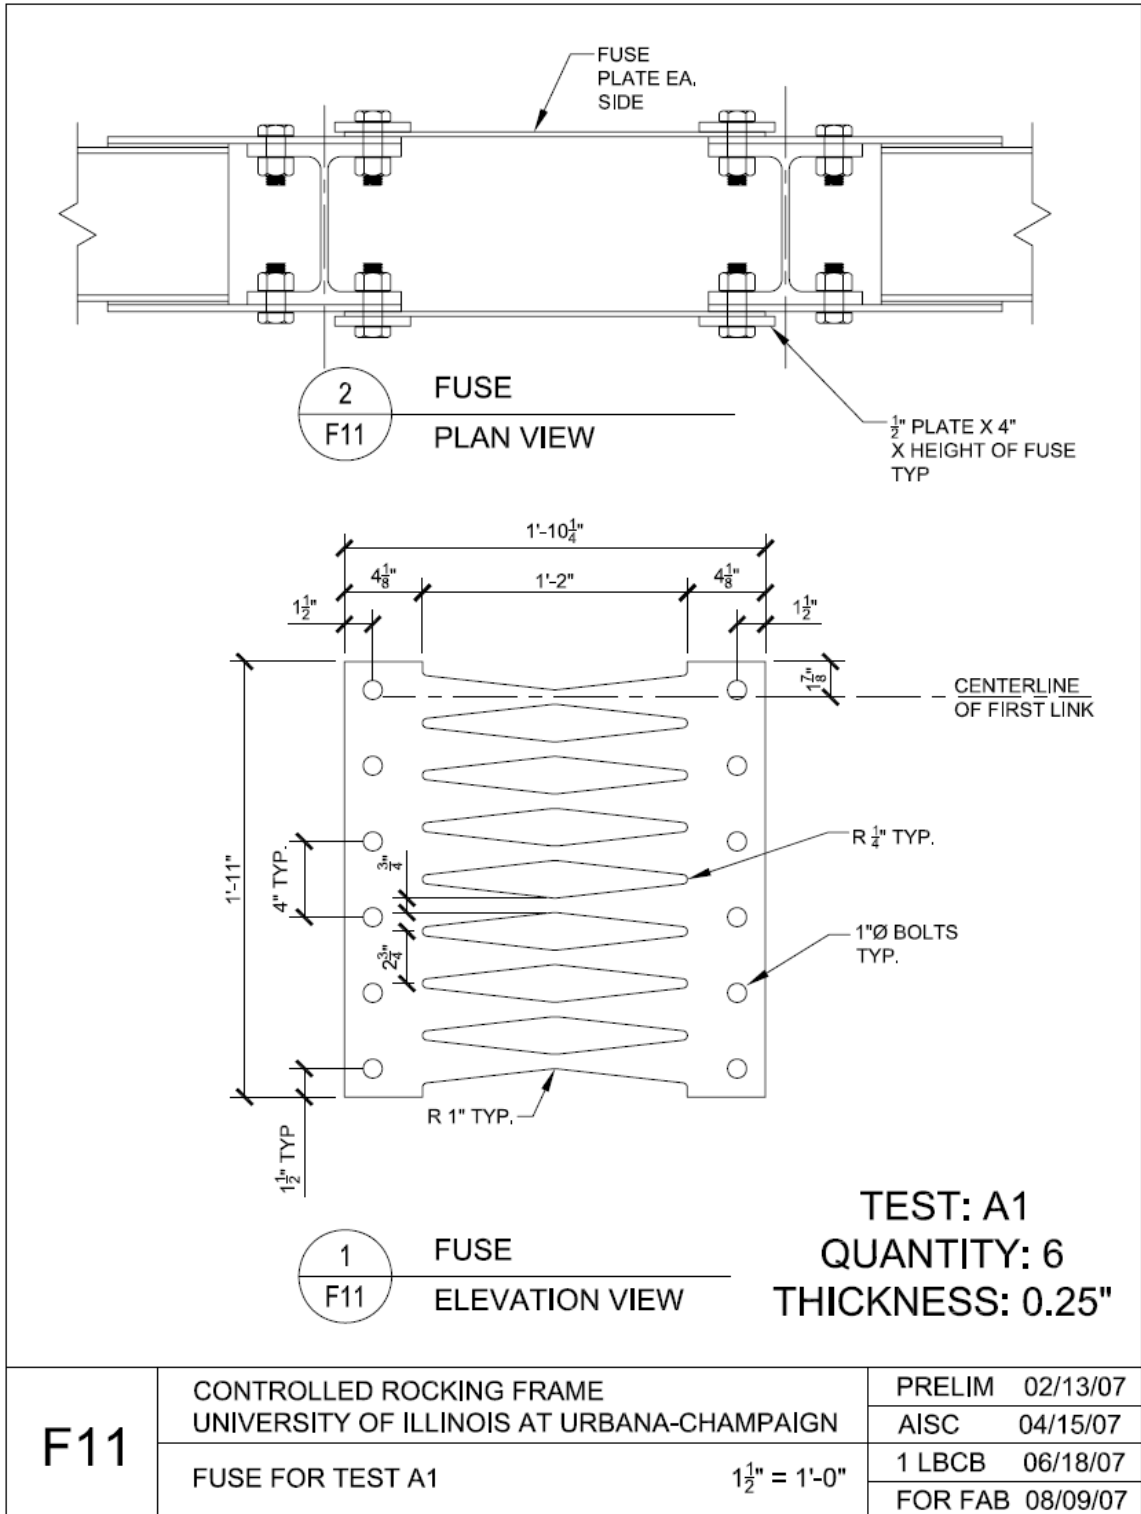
Specimen Design Drawing – Fuse for Test A1
